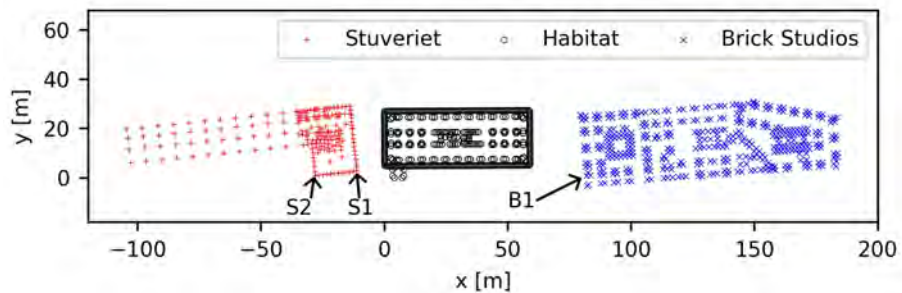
Overview of the existing pile foundations of Stuveriet and Brick studios and the deep foundation works of Habitat.
